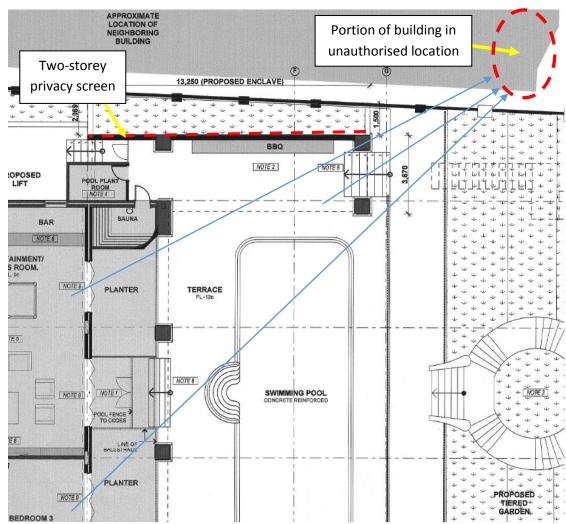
Neighbour (Northwest) – Lower Pool Level and Ground Floor
